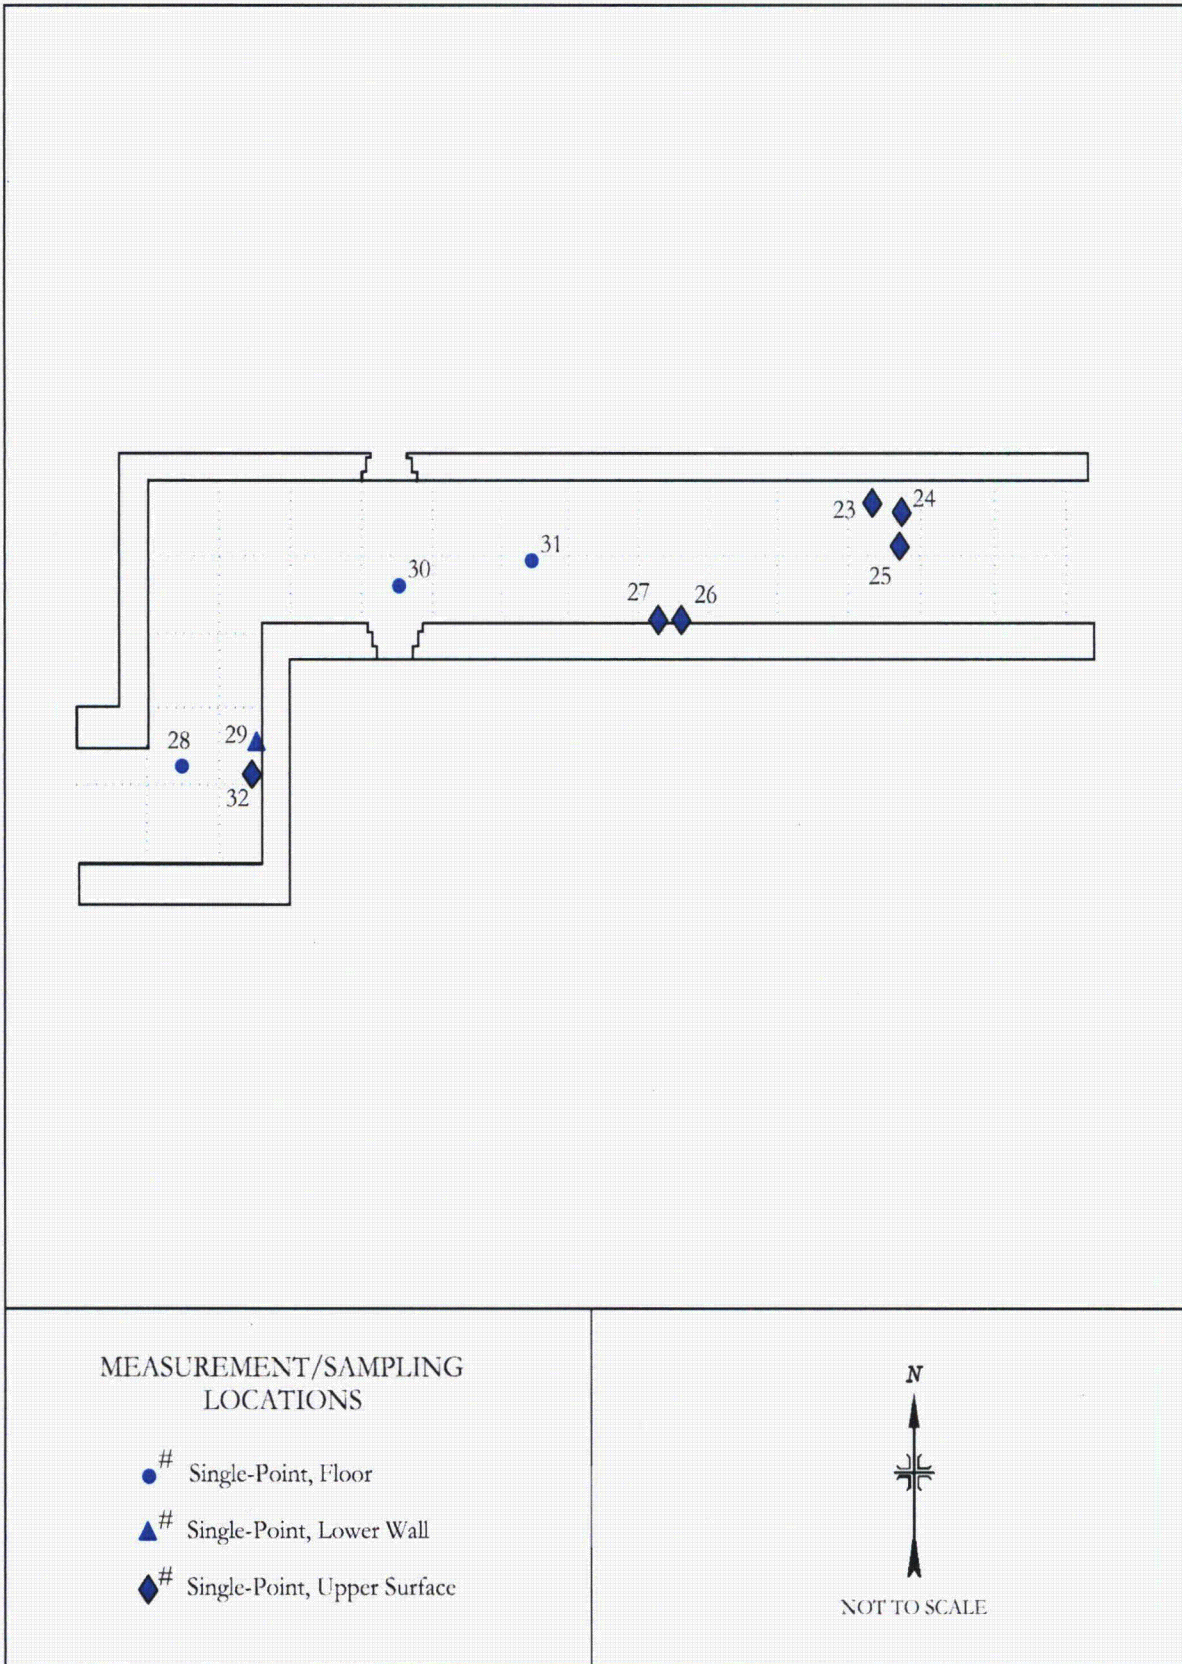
Auxiliary Building, Room 45 - Direct Measurement Locations
